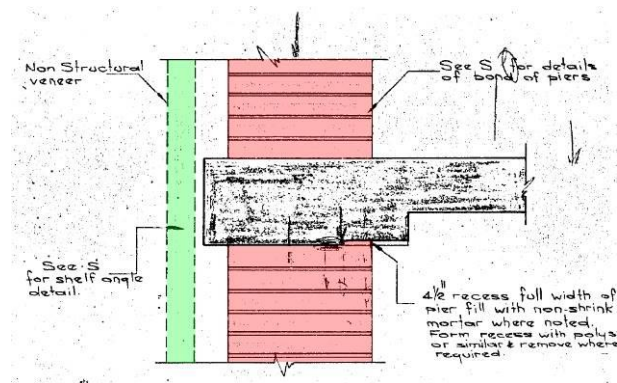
A vertical section showing the arrangement of the masonry and reinforced concrete slab. Shaded in red indicates the loadbearing masonry and in green indicates non-loadbearing brick veneer. The writings on the left-hand side note: 'non-structural veneer' and 'see [section] for shelf angle detail'. (Source: Buchan, Laird & Buchan 1971 [copyright](#))
